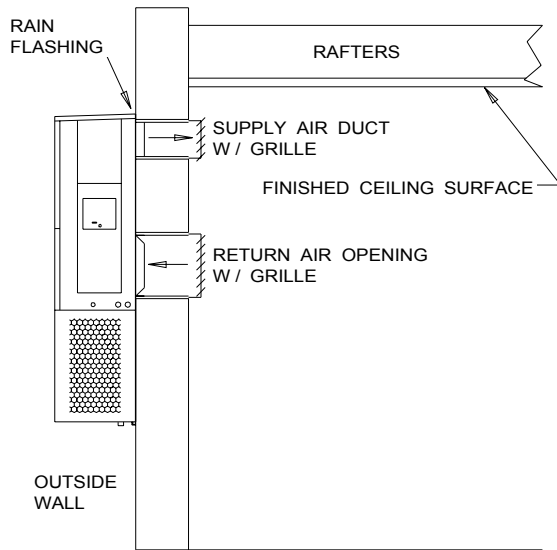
WALL-MOUNTING INSTRUCTIONS
